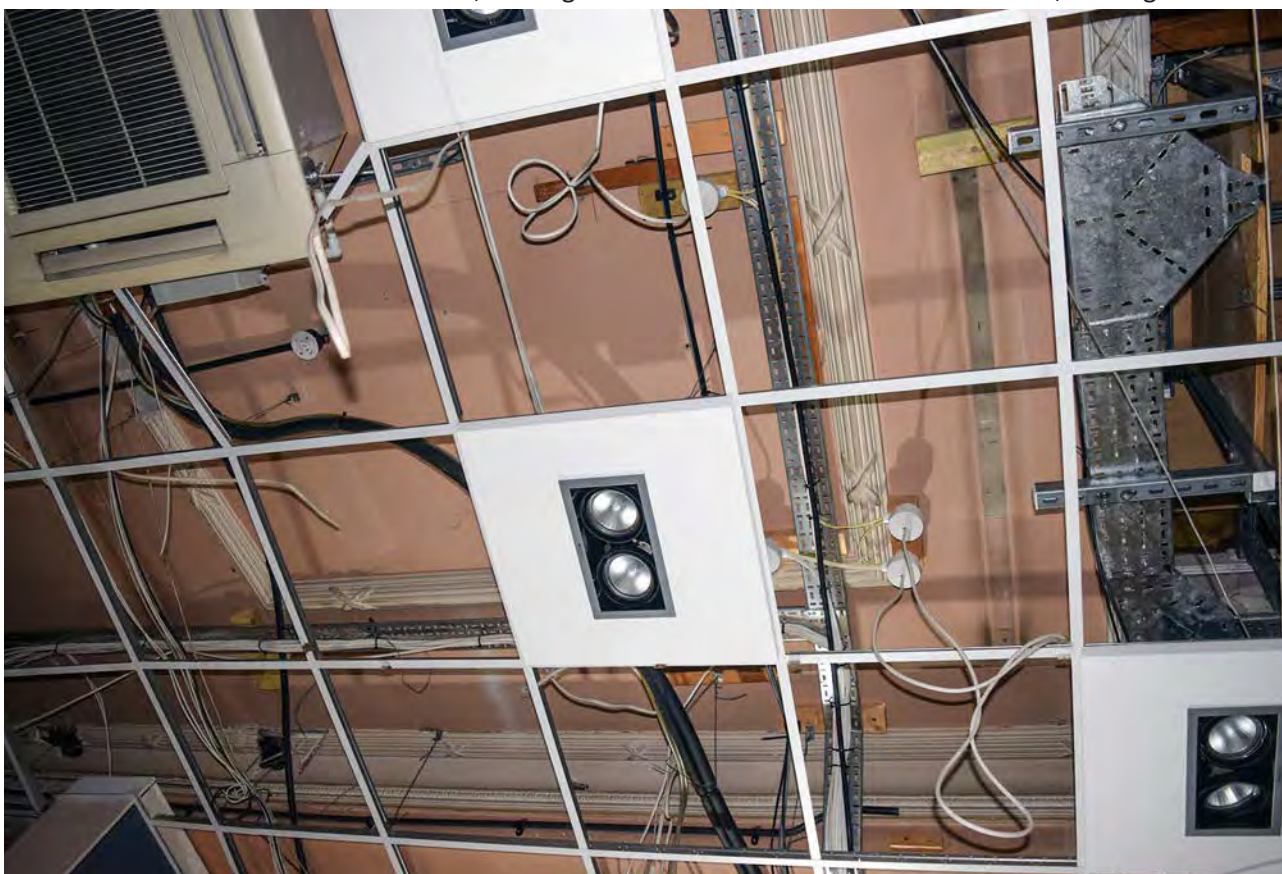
Ceiling in the ground floor of 31 Cornmarket Street
